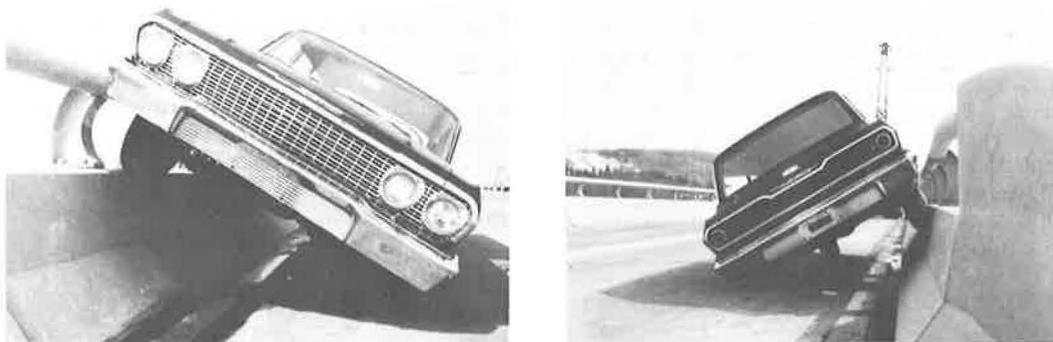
Placement of right front wheel of test vehicle on concrete parapet to show proximity of sheet metal to rail and wheel to post.
